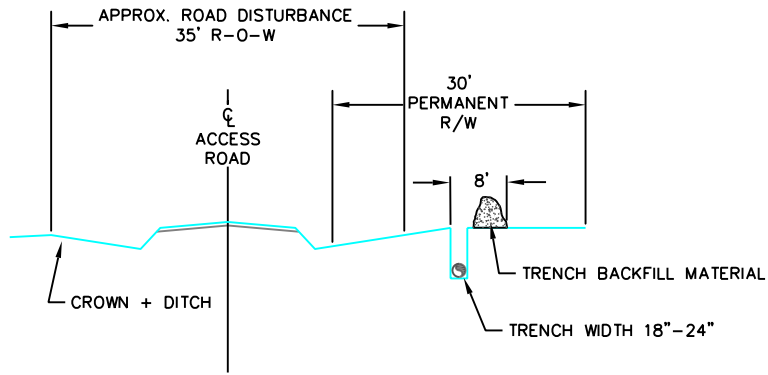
Typical Section of Gas Sales Pipeline Along Access Road, WRPA.
